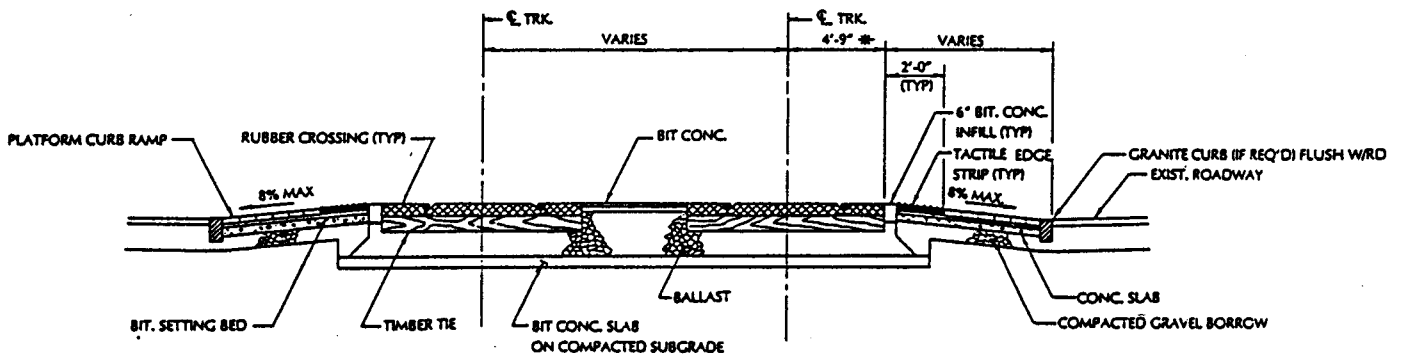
Rubber Grade Crossing Section at Platform Curb Ramp (C)
